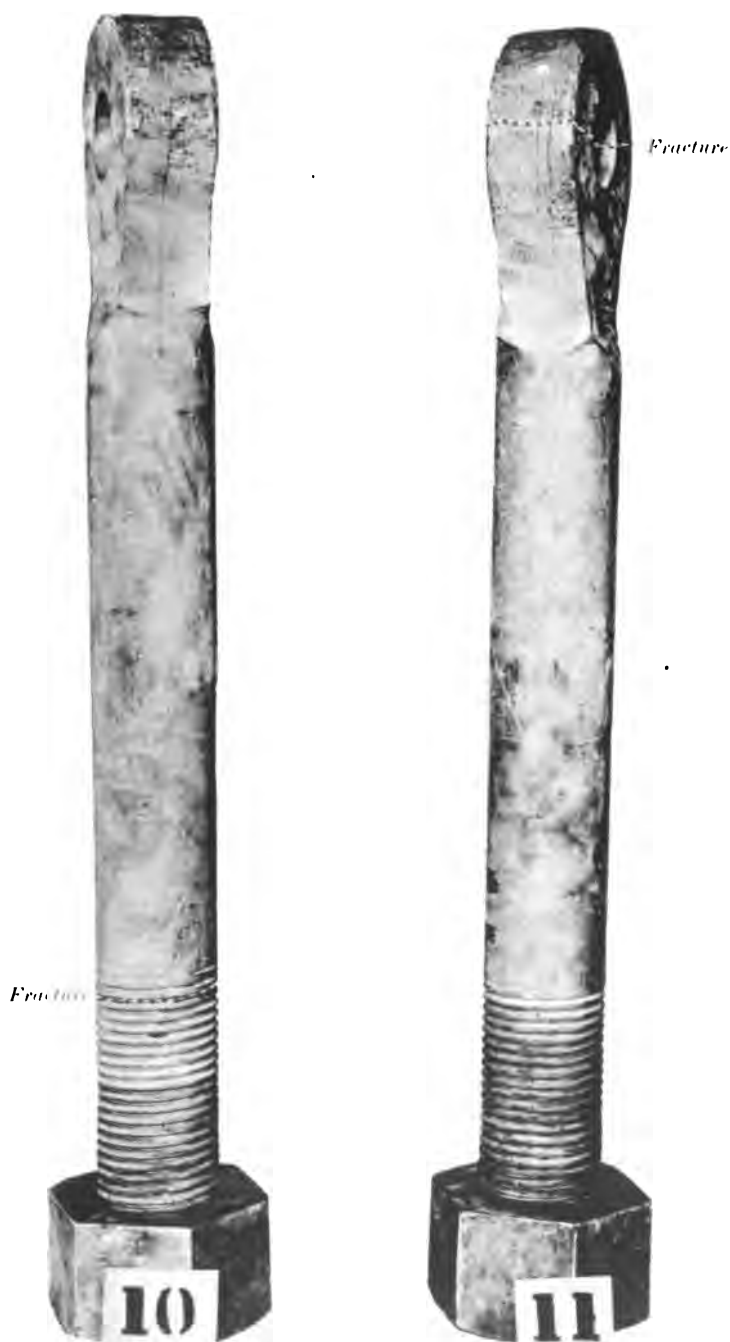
Bolt with eye-shaped head and hexagonal base. FIG. 2. Bolt with eye-shaped head and hexagonal base. FIG. 3. Bolt with eye-shaped head and hexagonal base.
